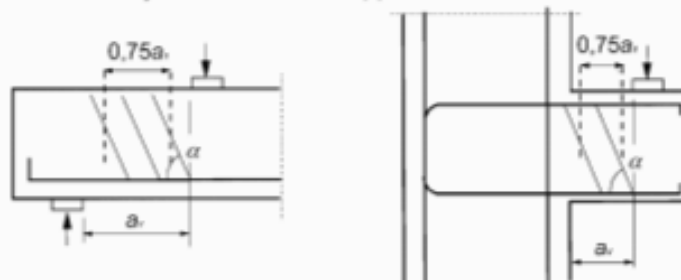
Shear reinforcement in short shear spans with direct strut action
